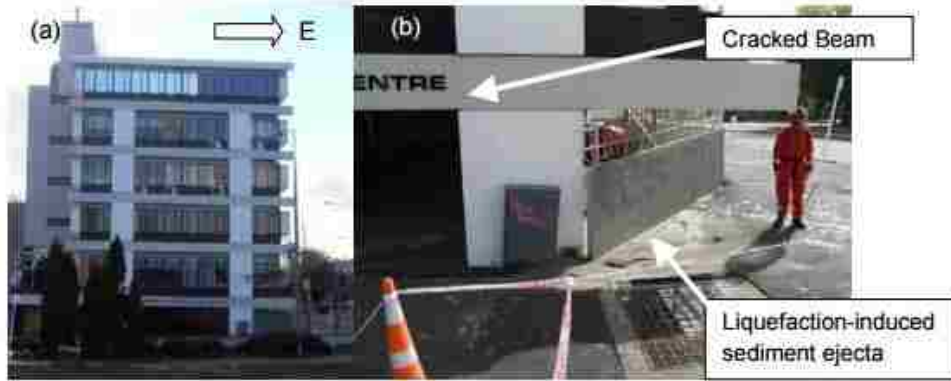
(a) Building tilt and (b) structural damage resulting from differential settlement (after Bray et al. 2013)
